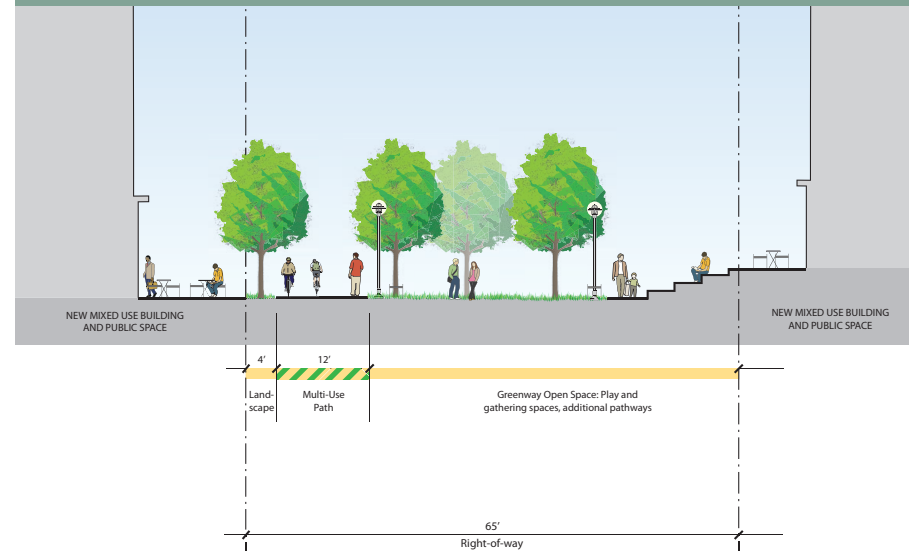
Downtown Greenway Vision, Potential Future Phase: Trail with new adjacent mixed use project and active rail.
